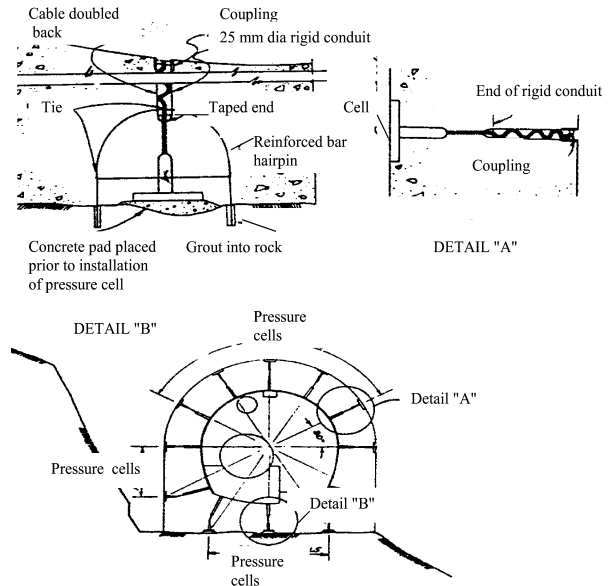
Pressure cells installation against the conduit foundation and outside conduit surface facing the embankment fill [16]
